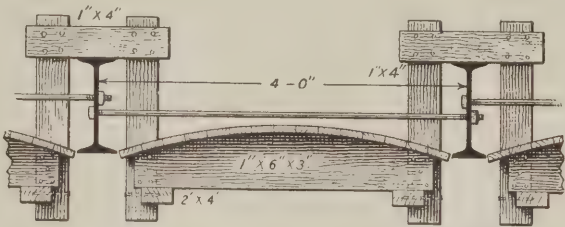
"Center" for Floor Span, Shown in Previous Figure.
